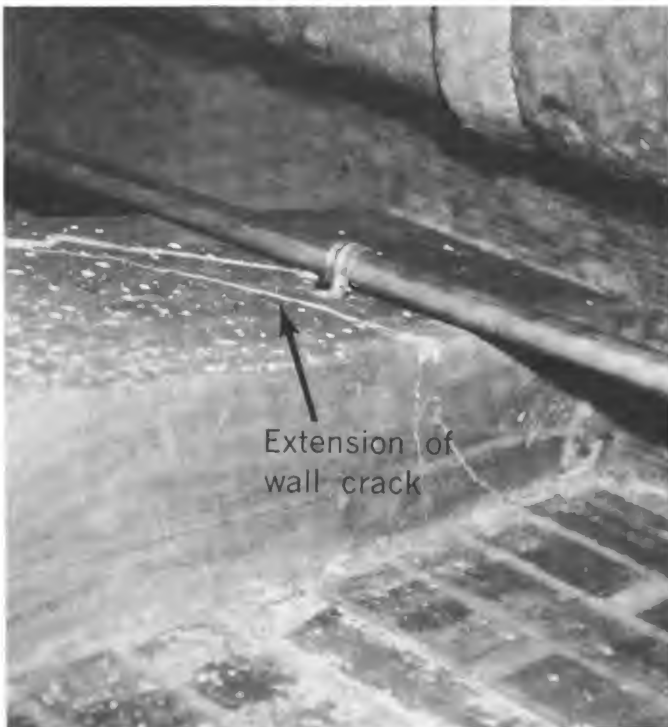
Pacoima Memorial Lutheran Hospital. Concrete column at brick wall on line 1x at line H. Crack through column is an extension of wall crack shown in figure 9. Loring A. Wyllie, Jr. photograph.
